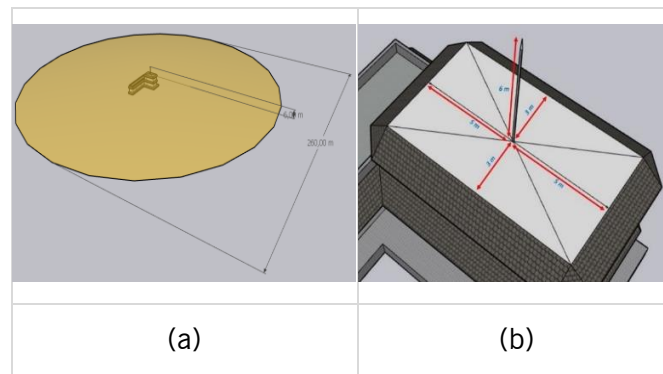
Design plan 2 for height 6 meters with Viking V6 a) covered area protection , b) air termination formation
